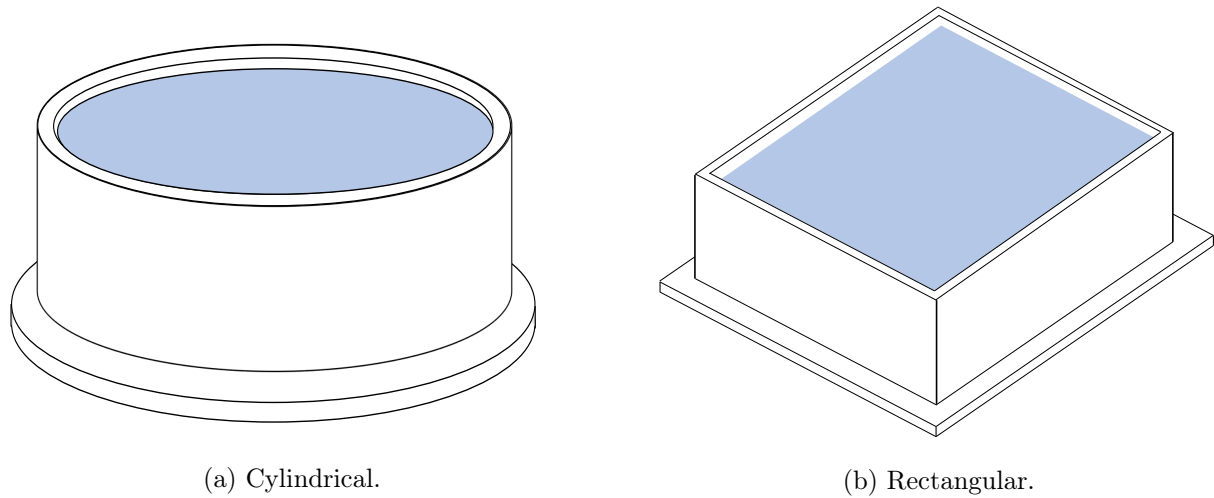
Typical shapes of reinforced concrete water retaining structures.
